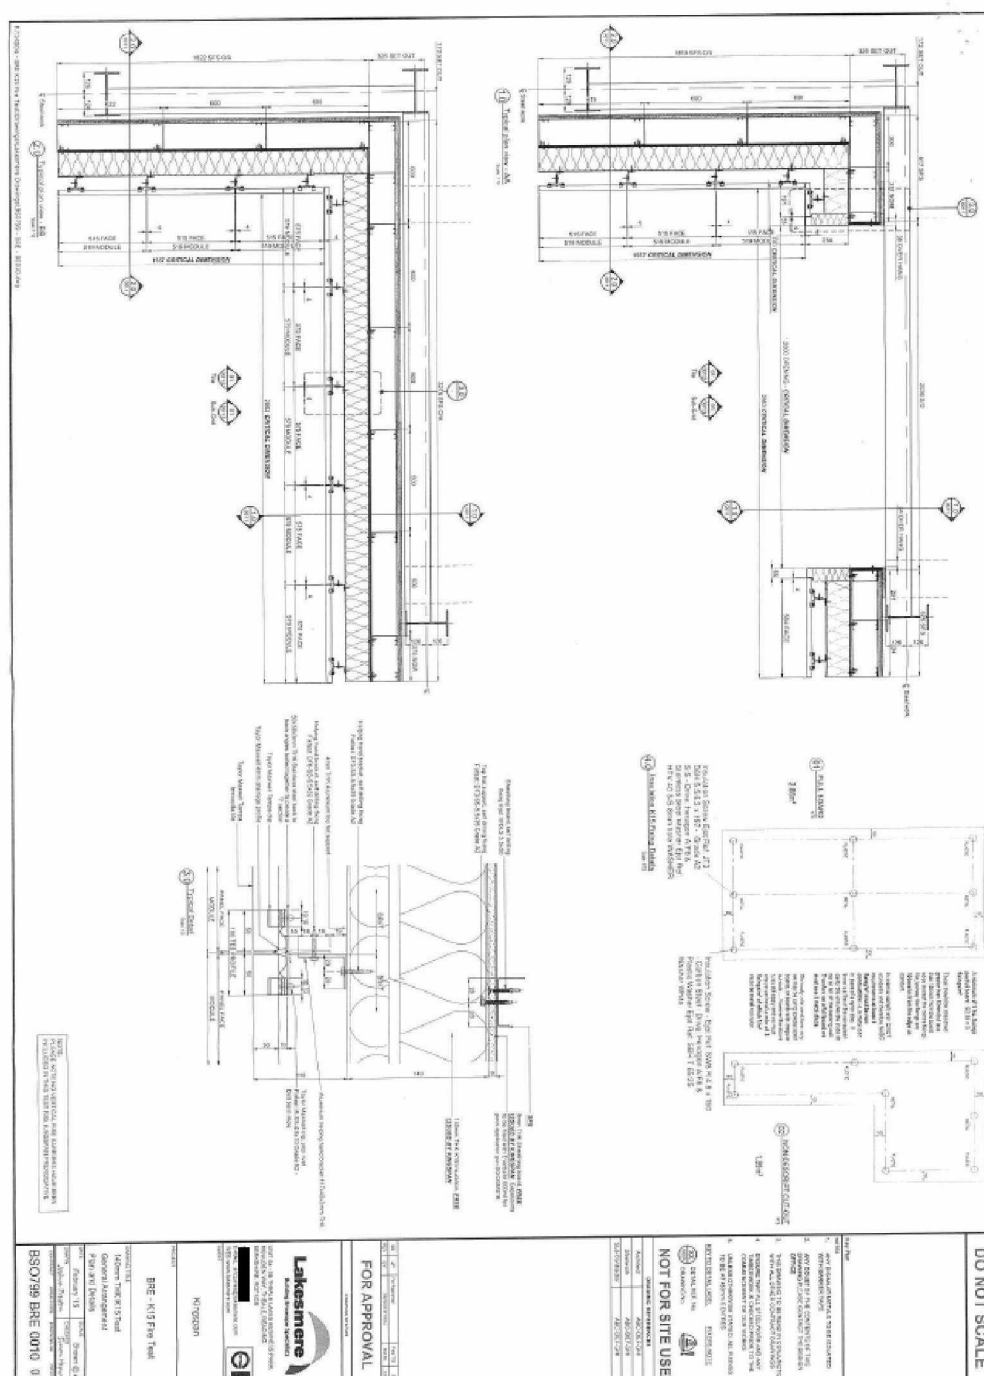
Construction of the System showing the layout of the structural steel frame
